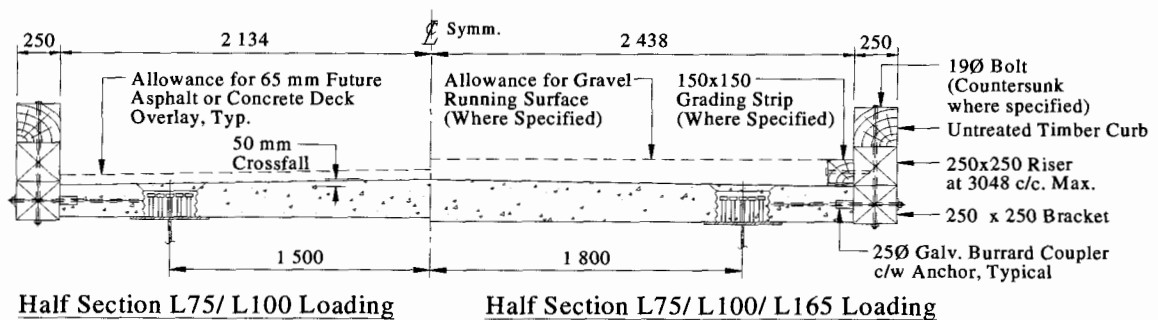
Standard Ministry Precast Concrete Deck Details
